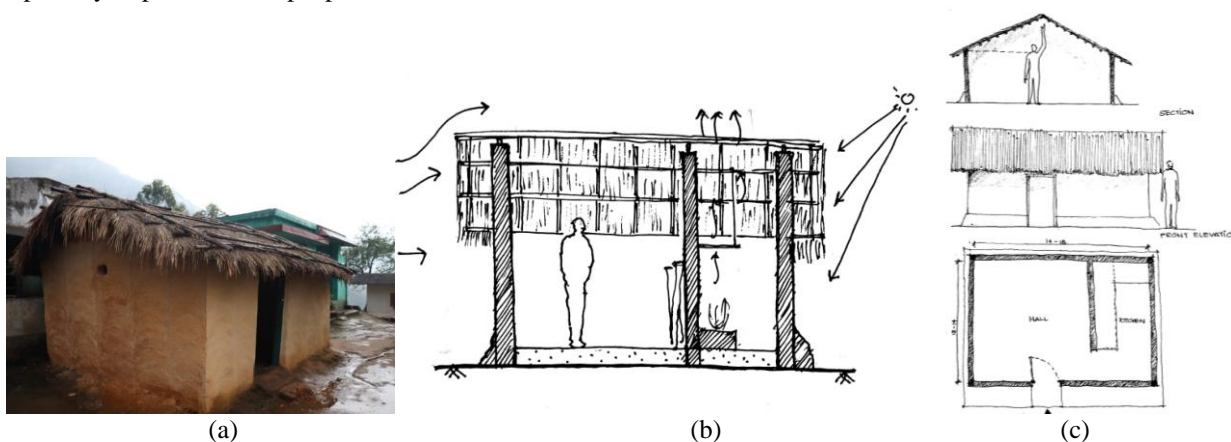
(a) Muthuvan hut (b) section (c) typical drainings
